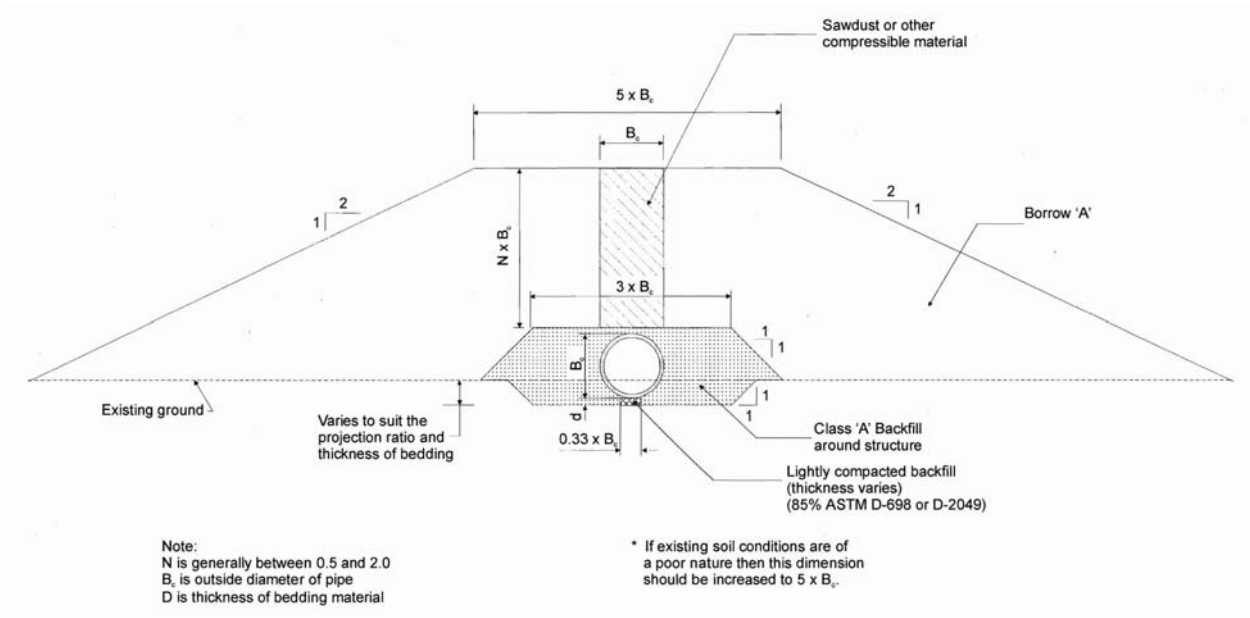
New Brunswick Department of Transportation typical induced trench installation.
